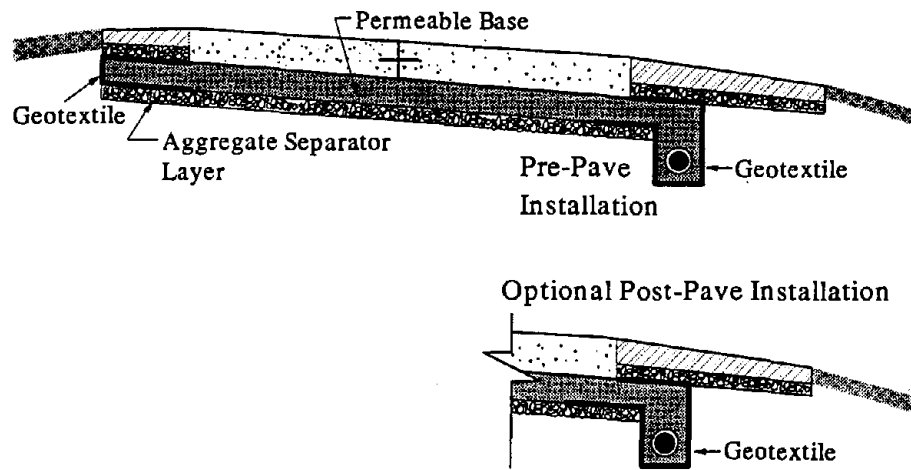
Typical cross section of subsurface drainage system for constant slope cross section and AC shoulders.<sup>(51)</sup>
